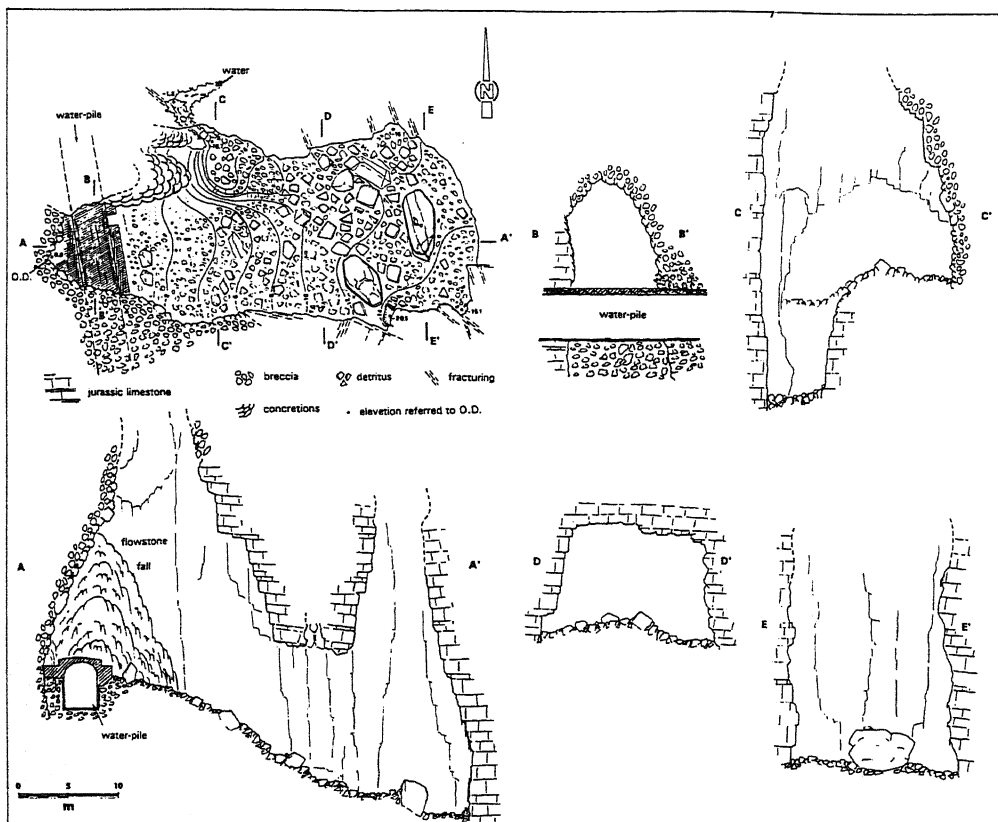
Topographic survey (plain view and sections) of the cave encountered by the upper tunnel. *Rilievo topografico (pianta e sezioni) della caverna incontrata dalla galleria superiore.
